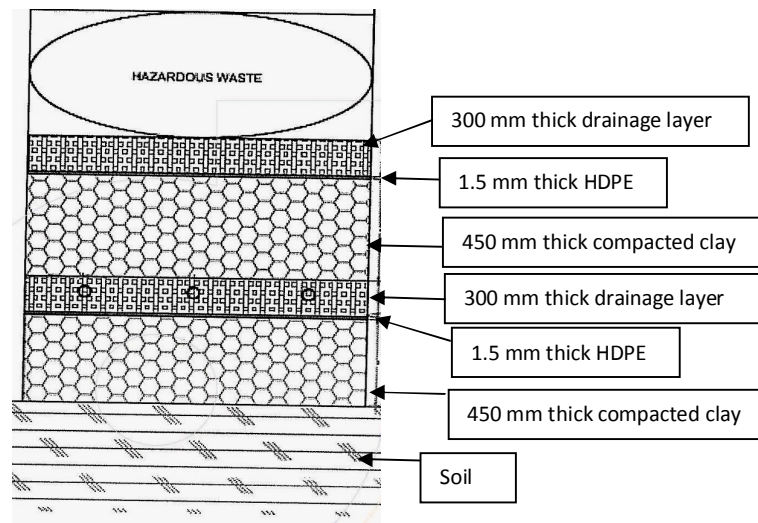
Section of Bottom Liner of Hazardous Waste Landfill
